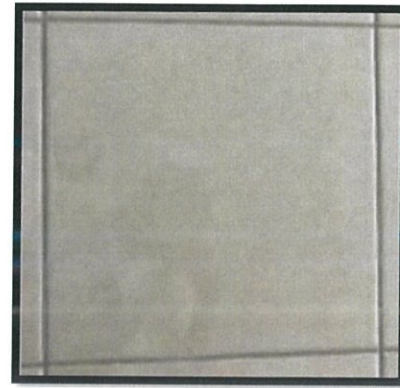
Kitchen, dining, living and bedrooms floor tiles
